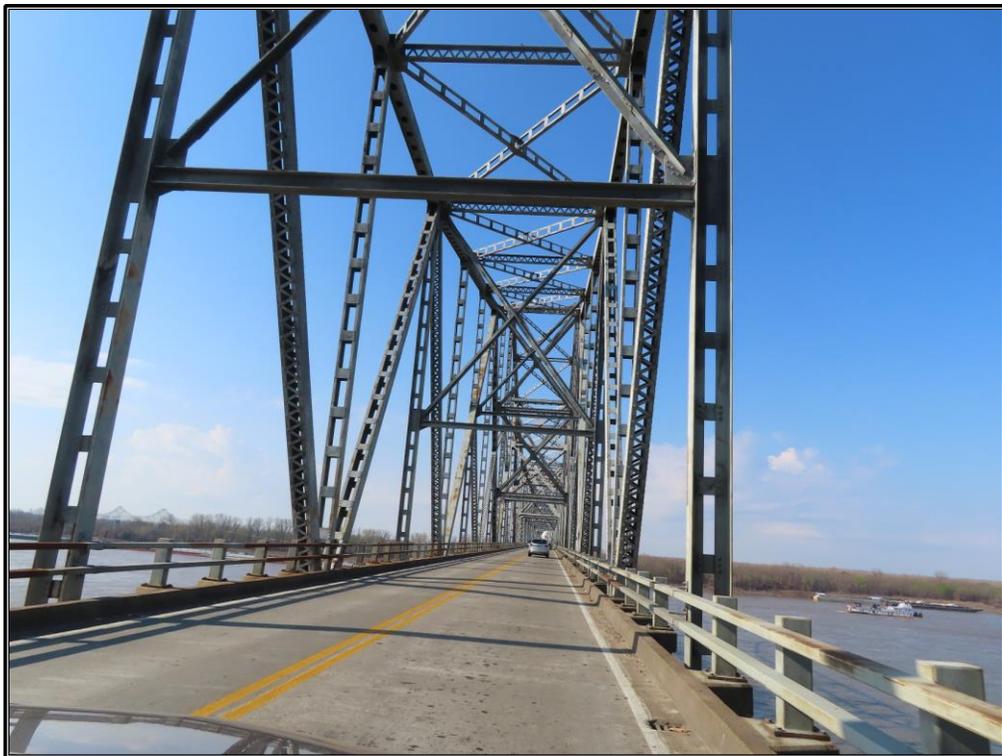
BA 241: Overview of the Cairo Ohio River Bridge deck and truss, looking southwest.
